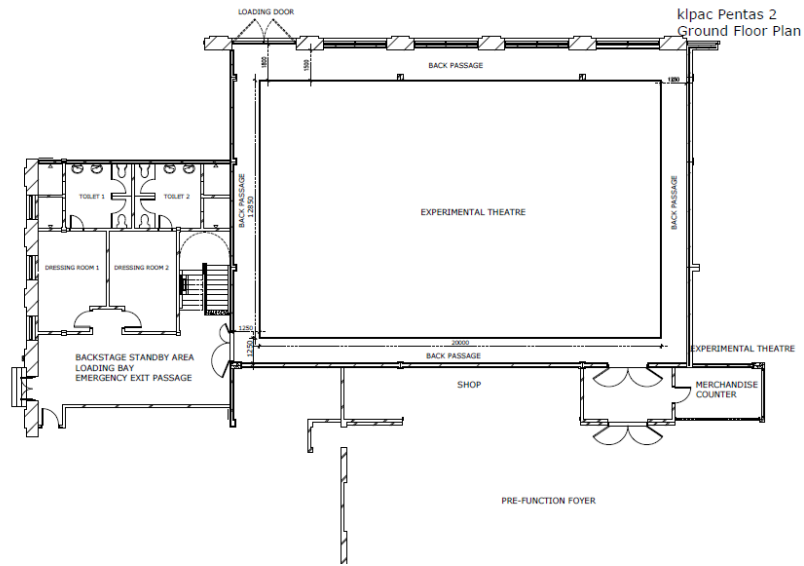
KLPAC Black Box Floor Plan. Source: Kuala Lumpur Performing Arts Centre
